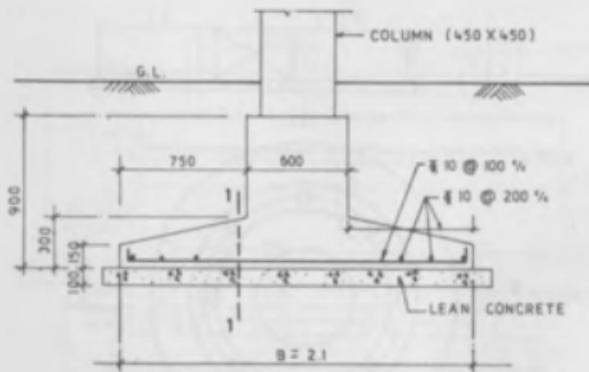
B. Section A-A showing critical section 1-1 for bending of slab.
